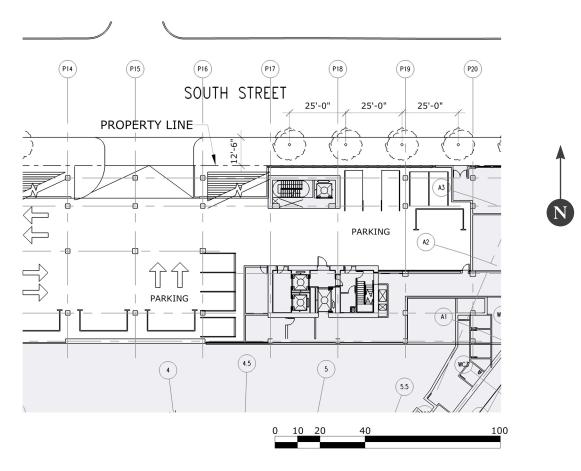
| SOUTH ST RETAIL AND GARAGE STREET LEVEL PLAN
